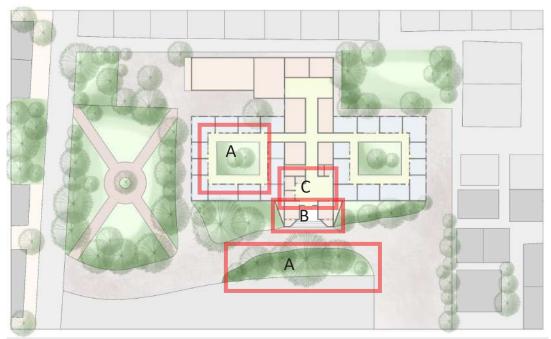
Floor plan showing the identified place attchments spaces Source : Author
